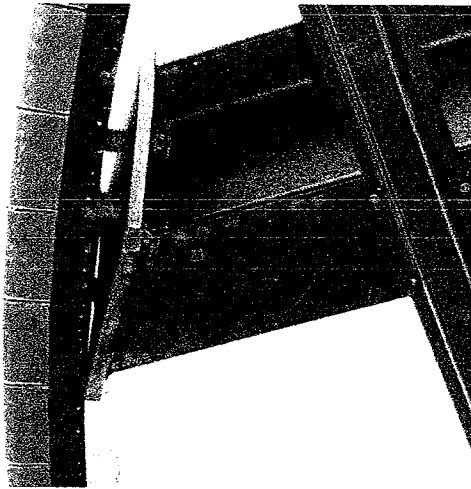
Rear entrance steel framing requires welded plate at gap.
